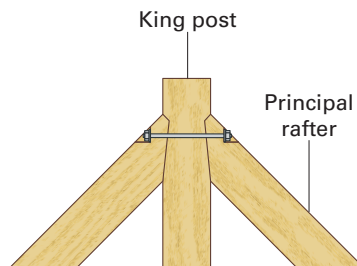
Making the principal rafter / king post joint more secure using a bolt
